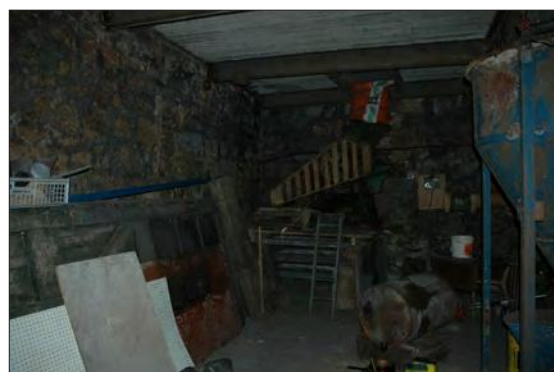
General view of chute from room 5 on the first floor as it enters room 1.
